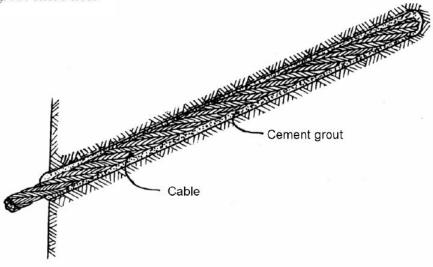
Grouted cables can be used in place of rebar when more flexible support is required or where impact and abrasion can cause problems with rigid support.
